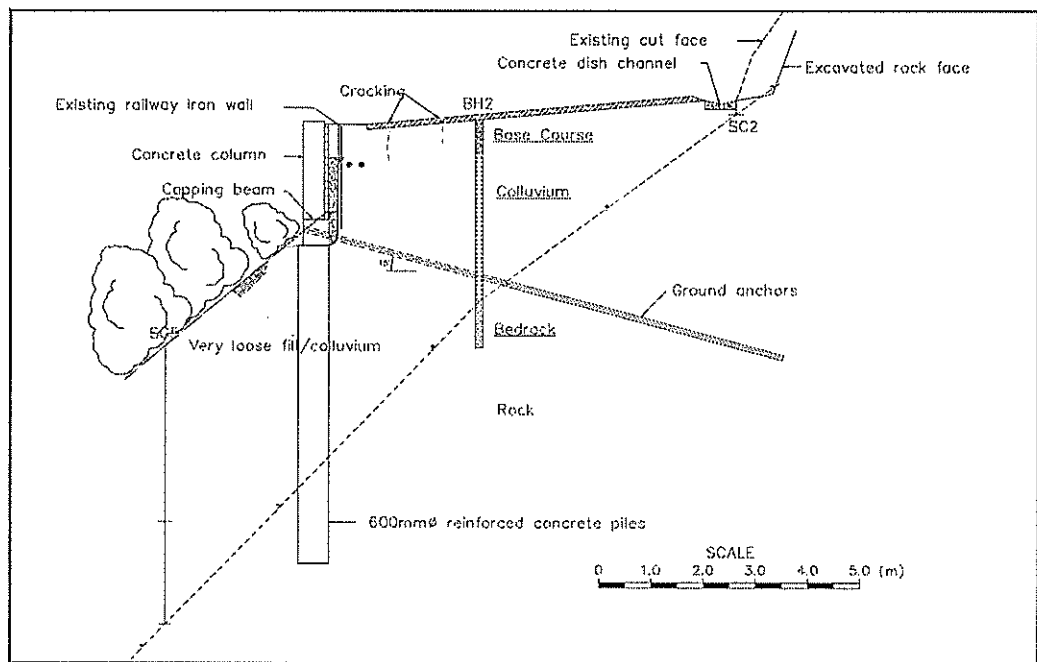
Typical retaining wall detail with concrete piles, capping beam and columns.
